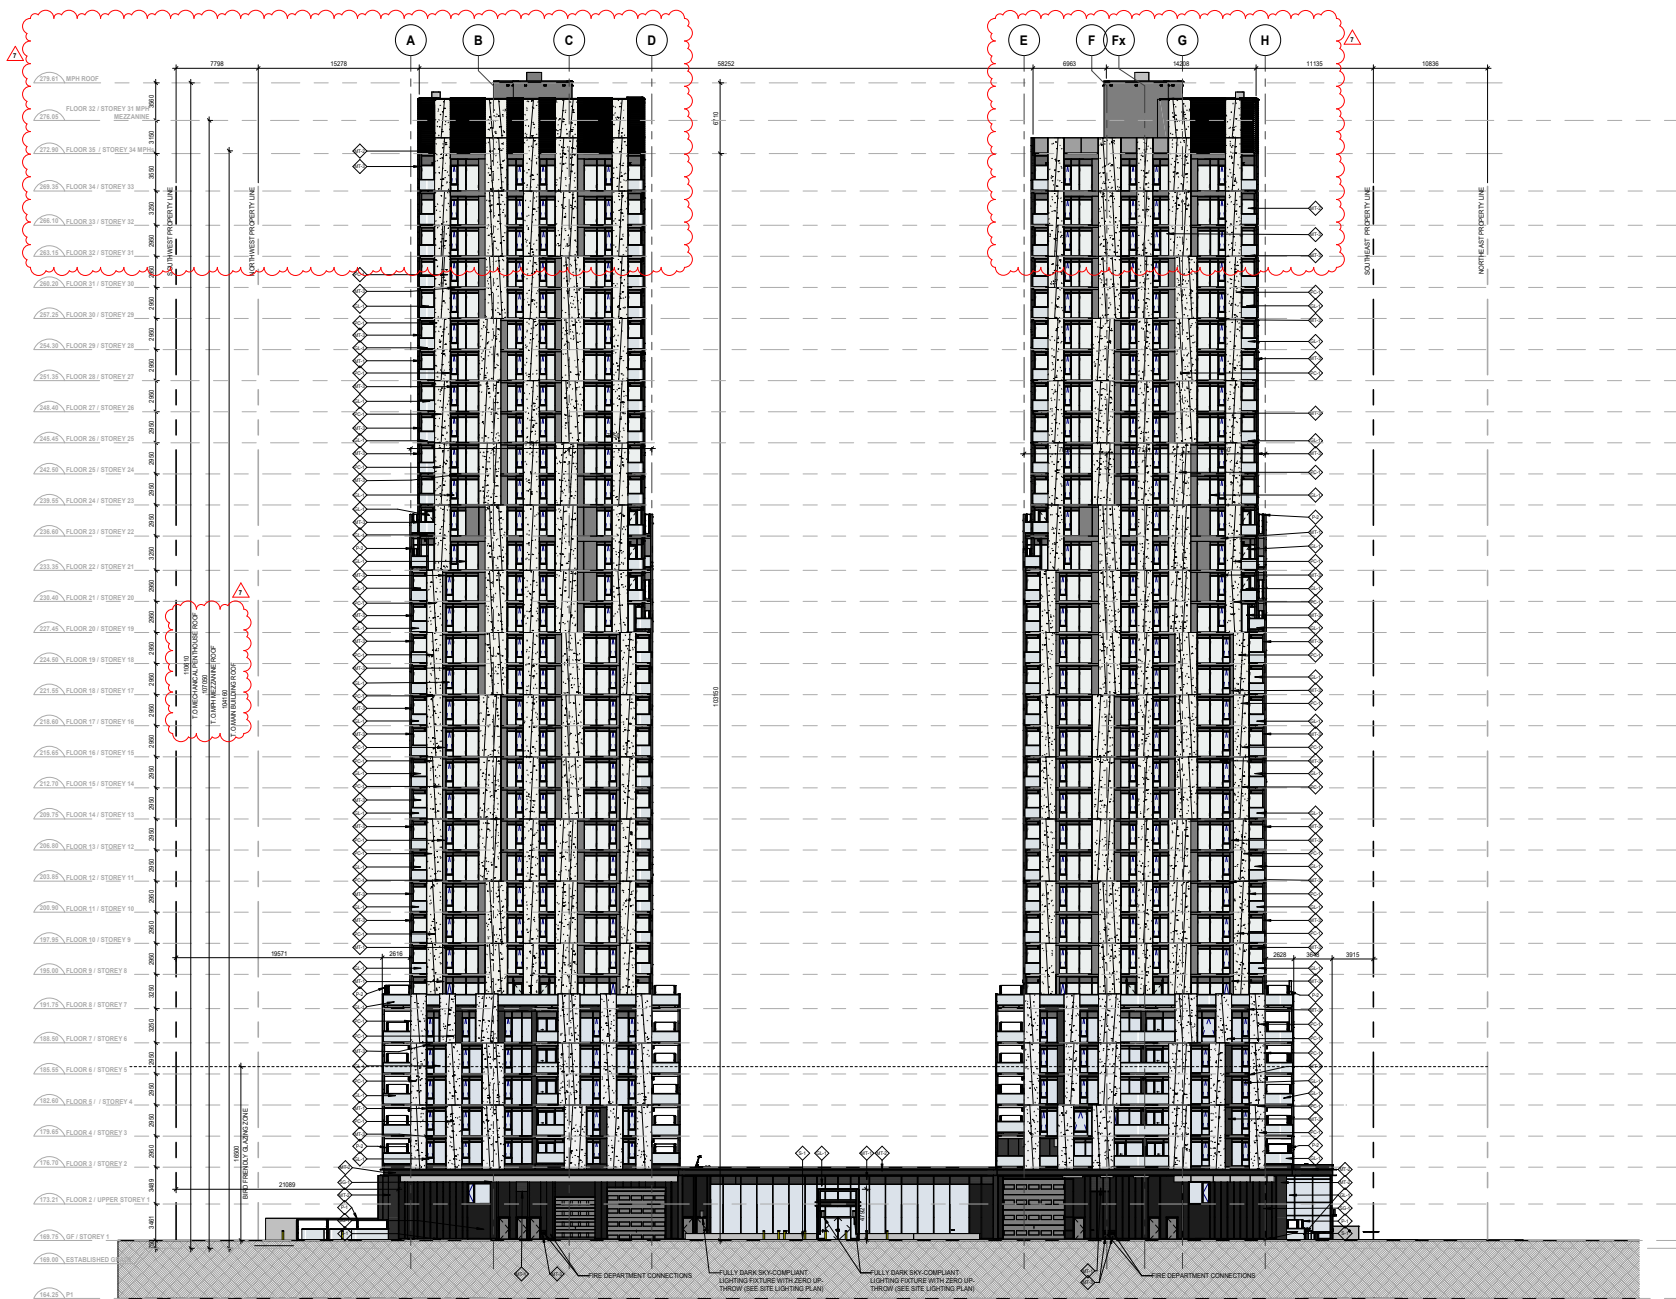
South Elevation by Quadrangle Architects Limited (not to scale)
